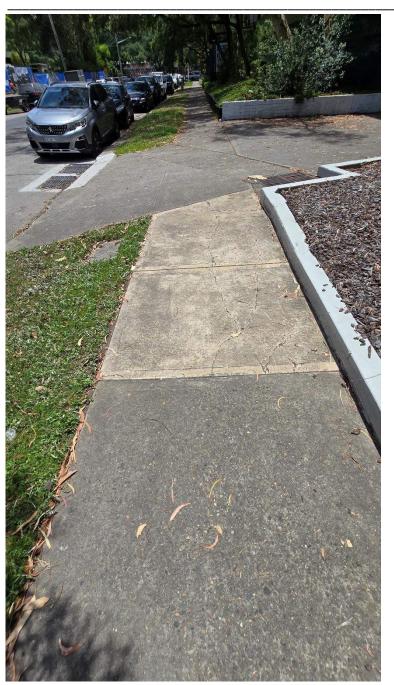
Cracks observed (18) - Footpath concrete cracks
